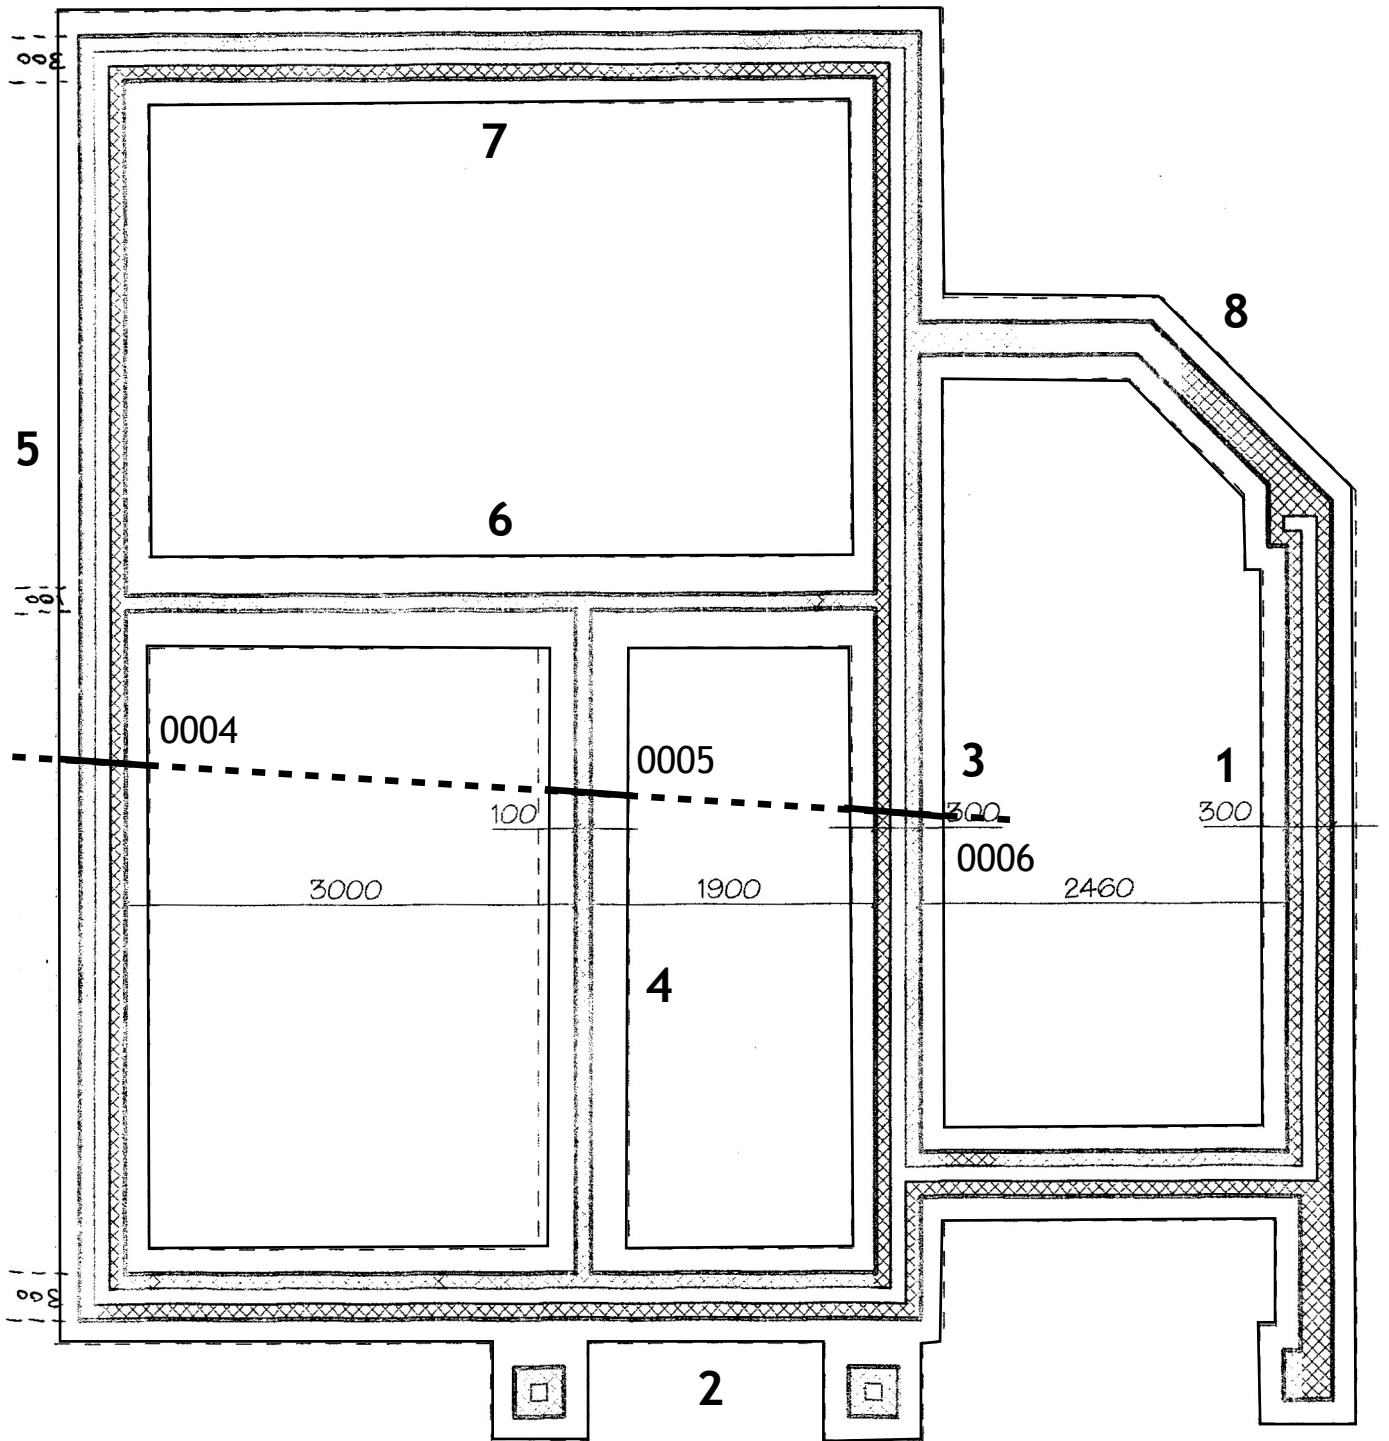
Ground floor plan of new building at 218 Main Street, Horsley Woodhouse, Derbyshire, showing foundation trenches, numbered 1-8, and projected line of soak-away 0004-06 (dashed line). Plan not to any particular scale.
